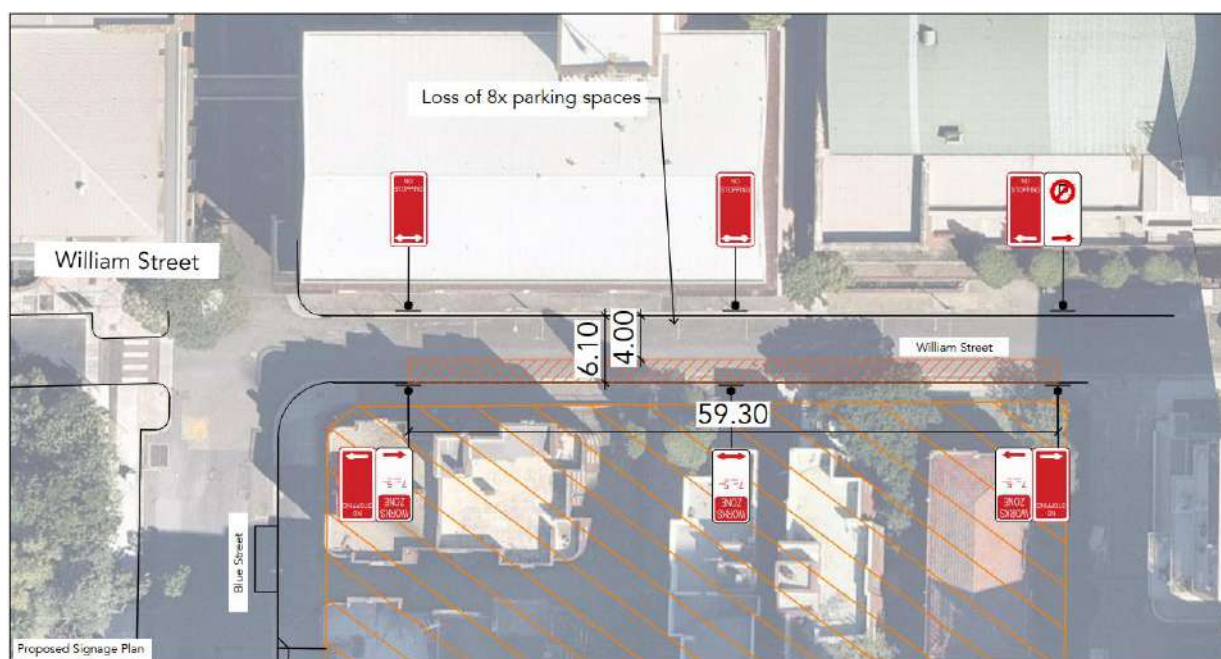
Proposed Signage Plan in William Street and Blue Street Intersection (Construction and Fitout Only)
